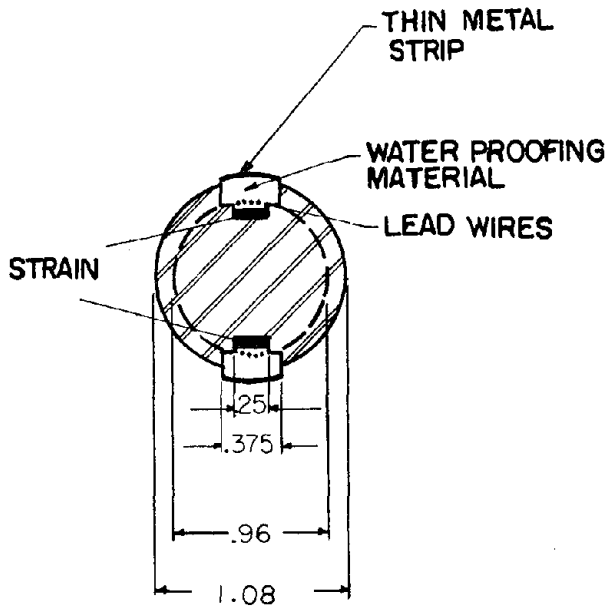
Typical Section of Instrumented Grooved Bar
